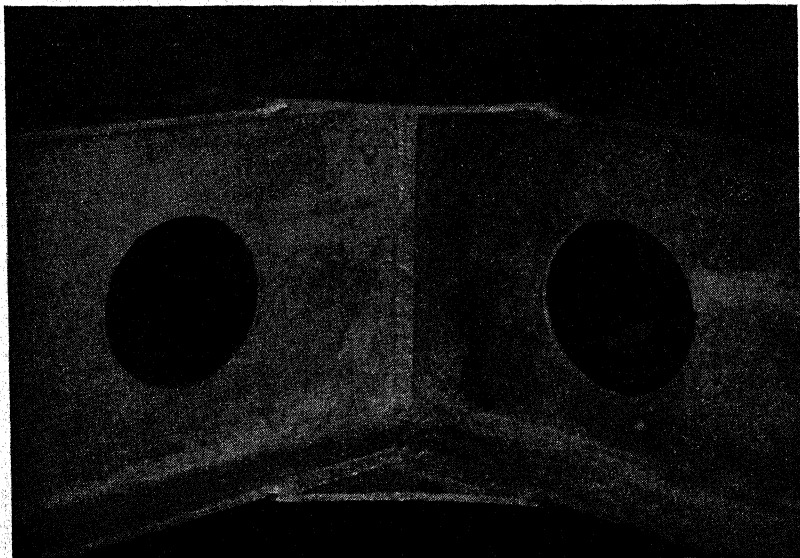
Welds at intersection of X-frame members. The members are 60-pound I-beams with $\frac{1}{2}$ inch top and bottom gussets.
